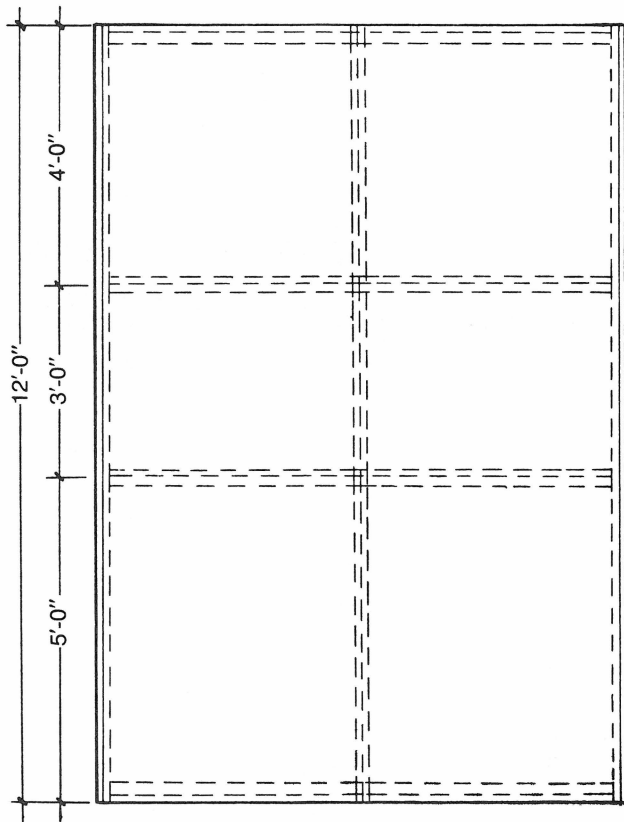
Constructional details of fixed plywood elements on west and south walls. Panels of 2 foot and 4 foot width are utilized.
